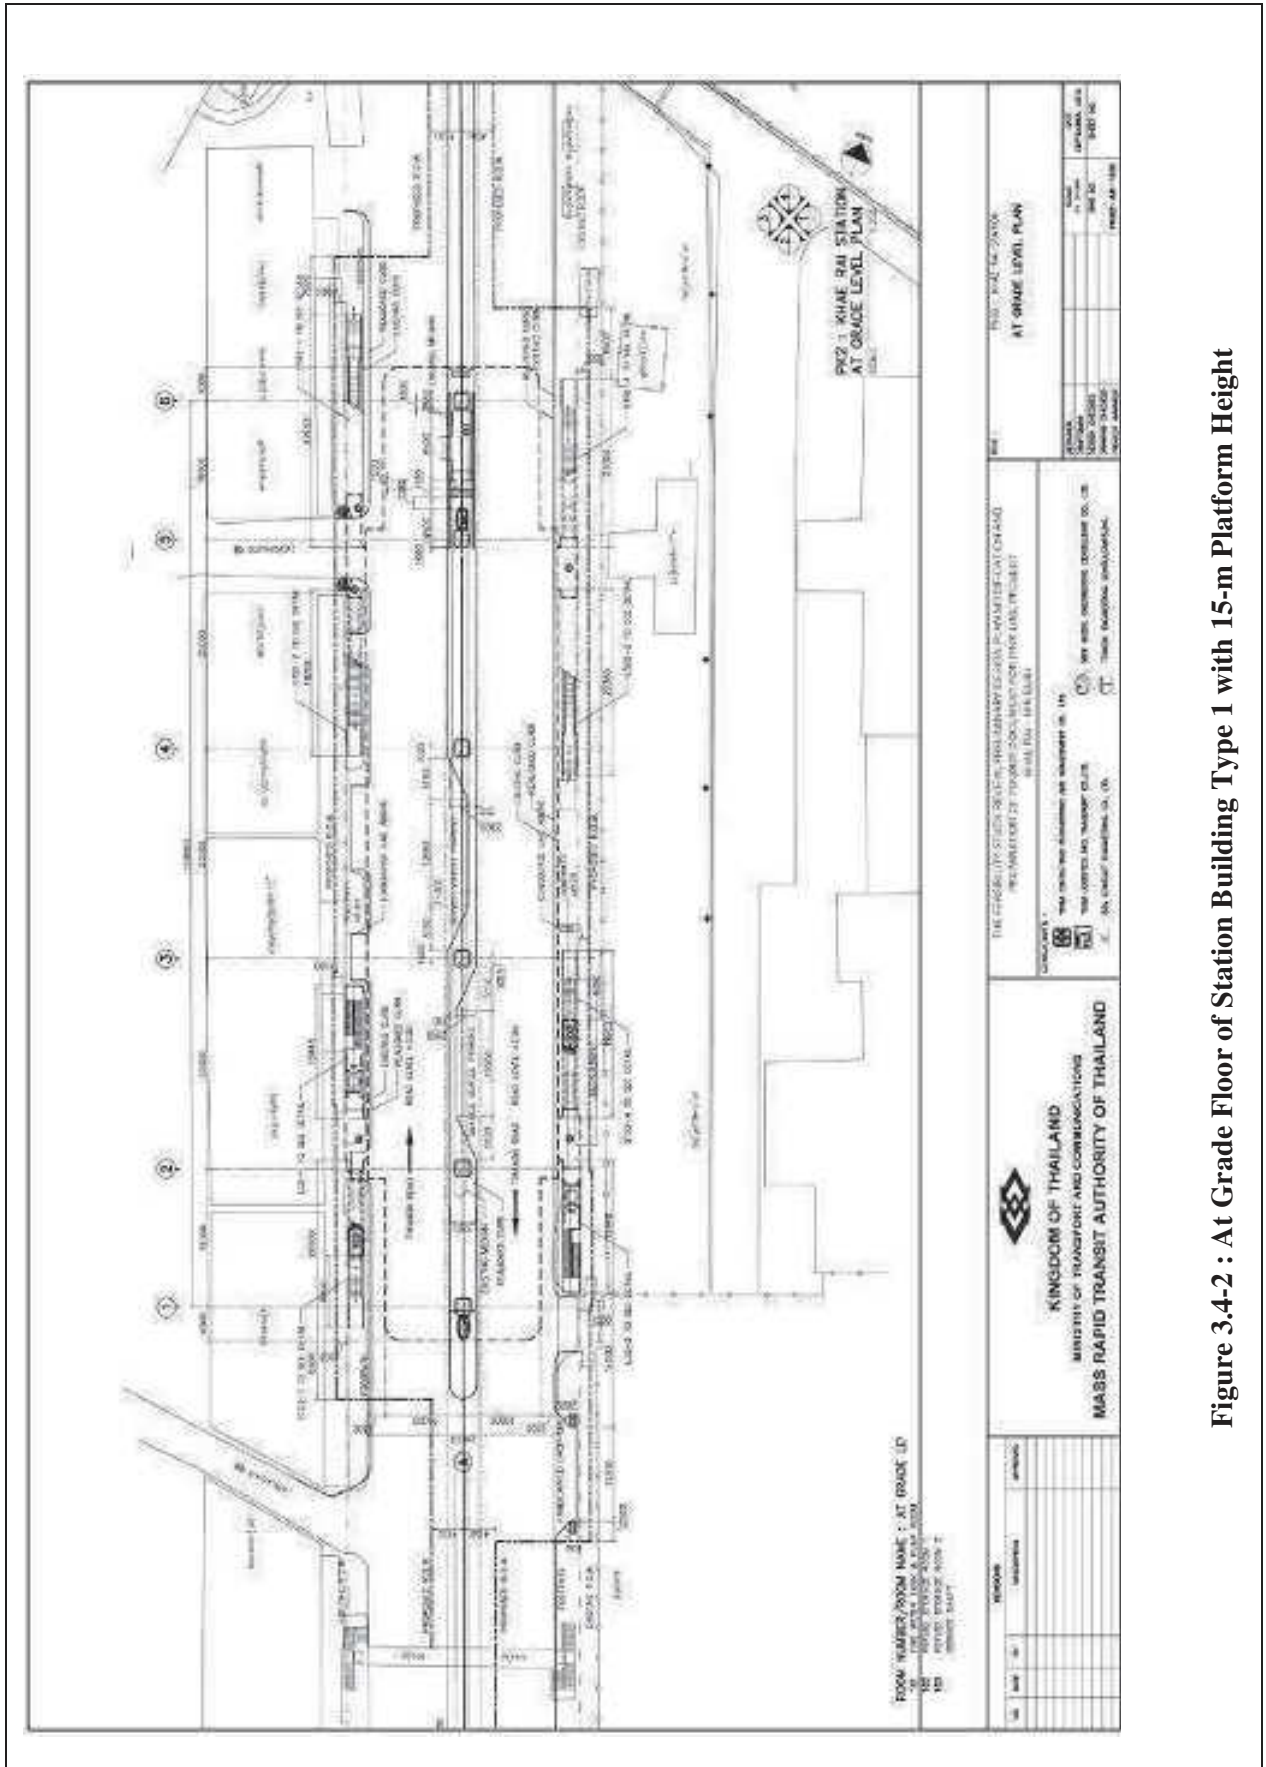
At Grade Floor of Station Building Type 1 with 15-m Platform Height
